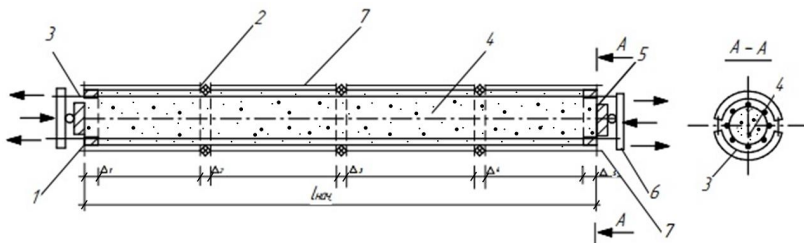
Longitudinally Movable Sectional Formwork for Prestressing Reinforcement on Concrete Mix
